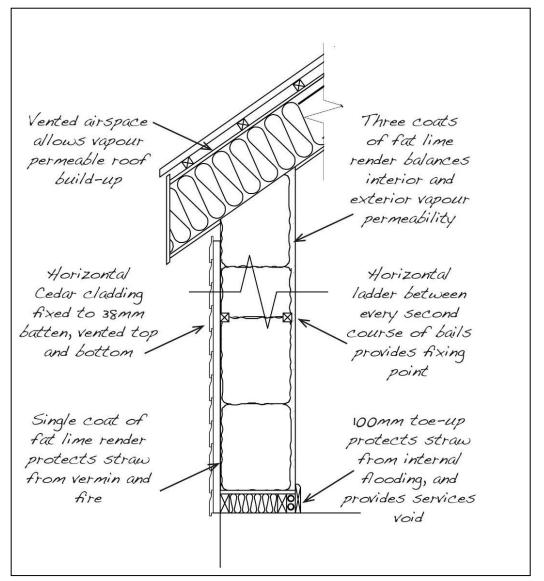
Simplified section through a straw bale wall with a vented timber rainscreen cladding pane
